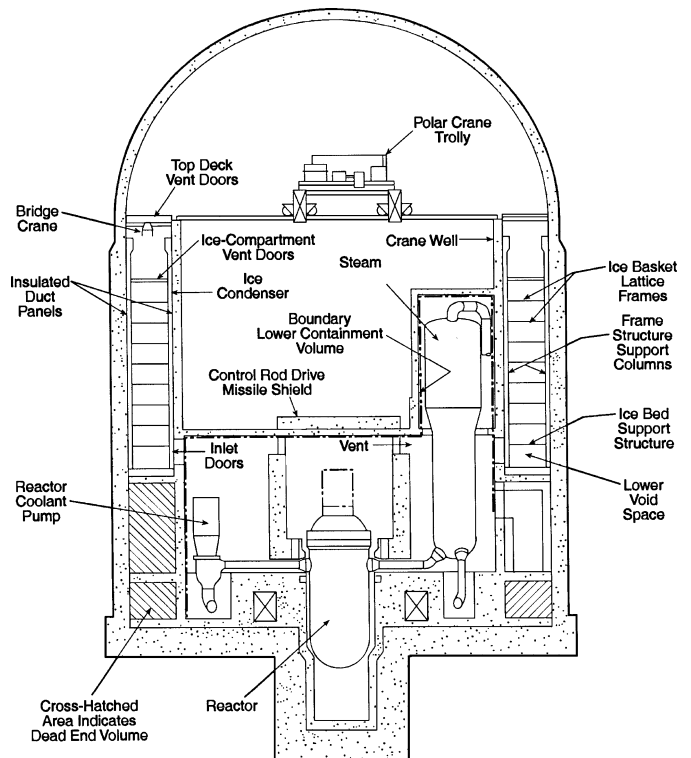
PWR CONCRETE ICE CONTAINMENT
